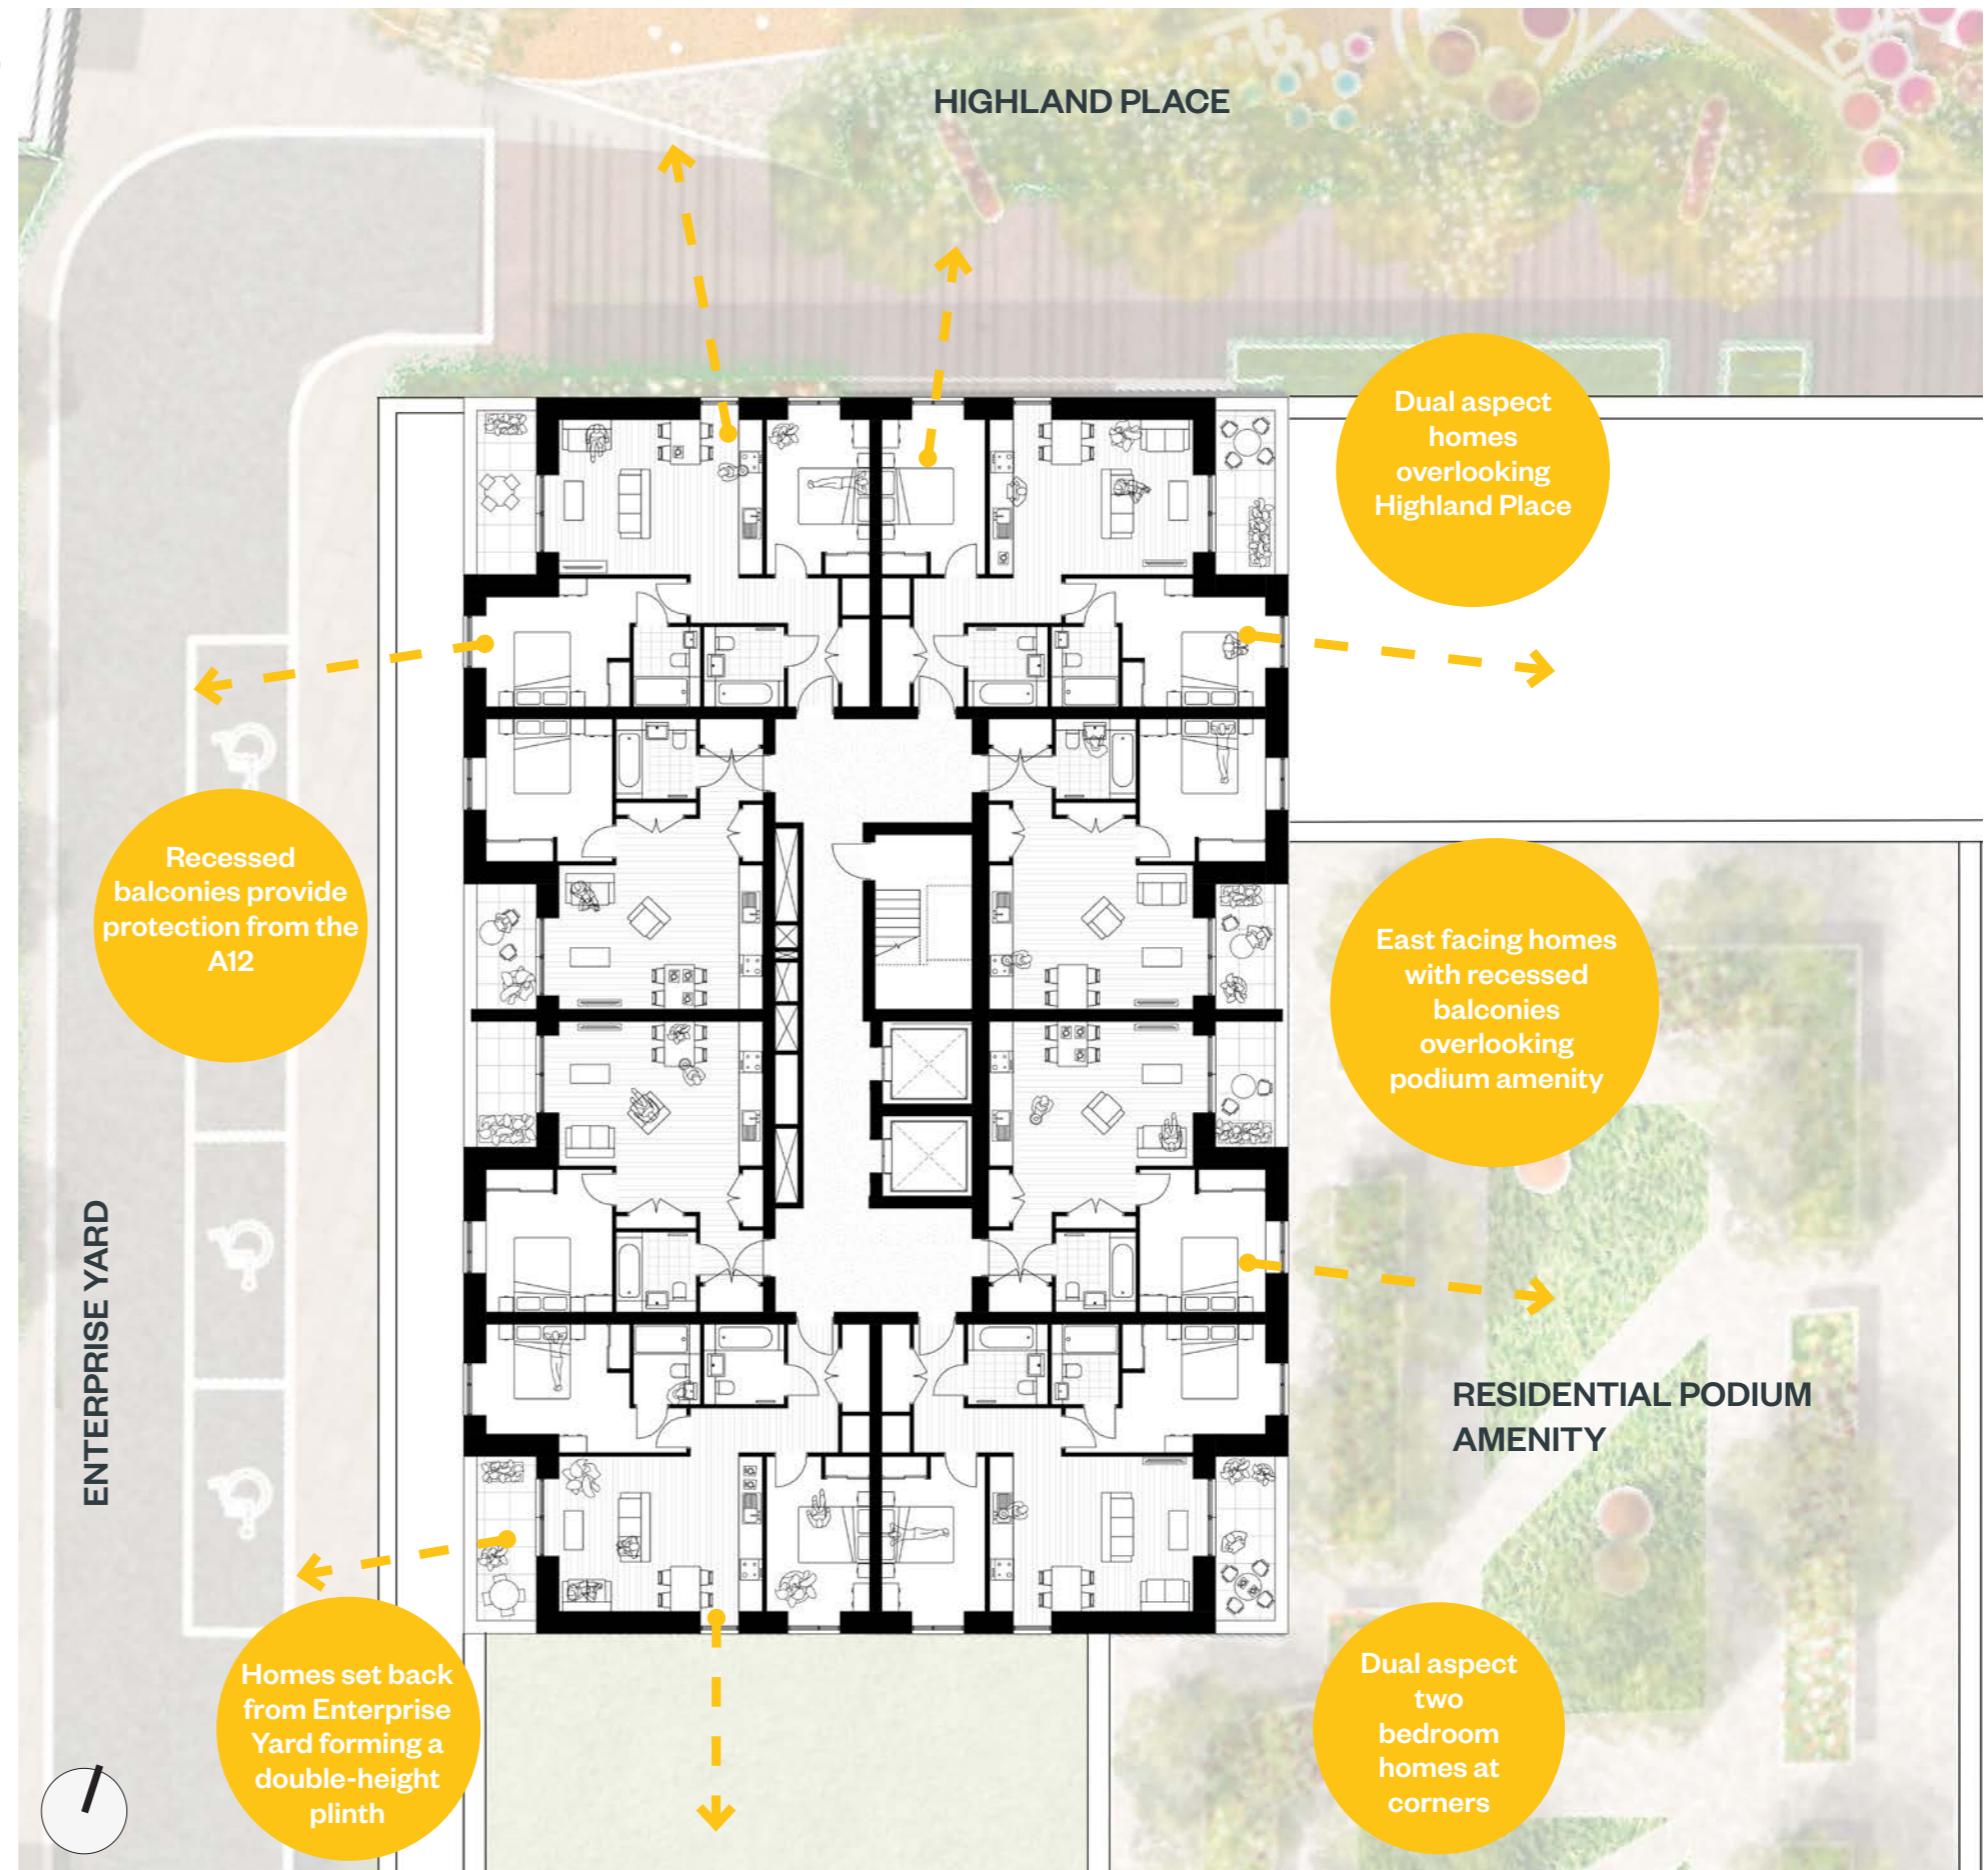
Typical floor plan of Building B2 and C1, illustrating building organisation and the internal plan of each home
